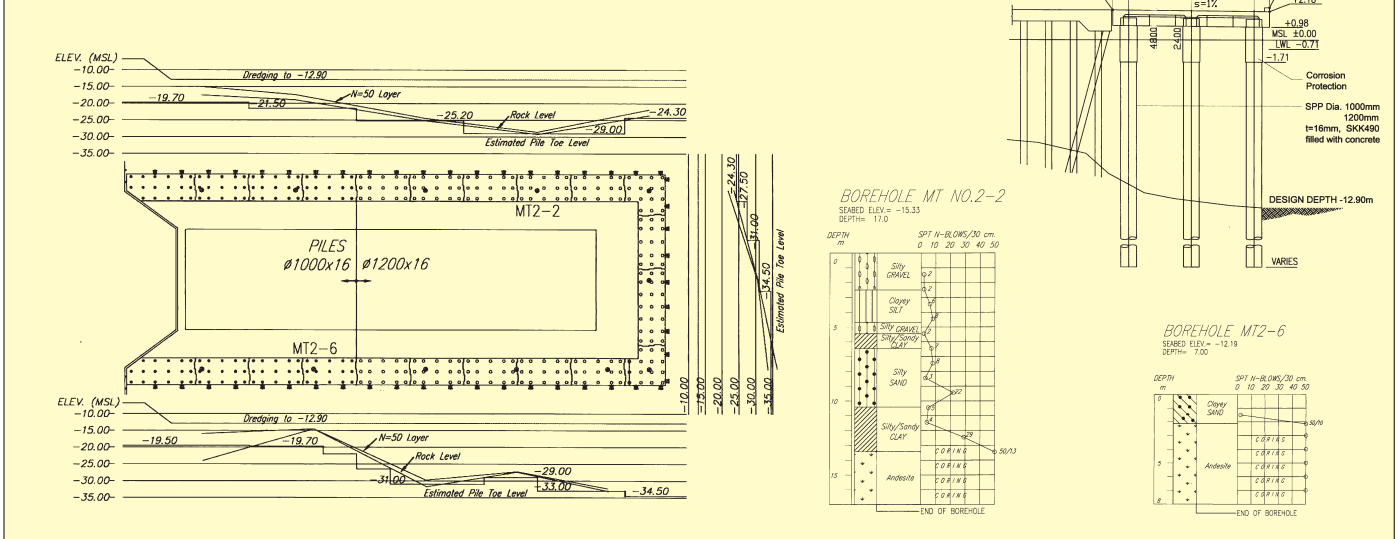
Marginal Pier at Marine Terminal—Plan, Section and Sub-soil Data
